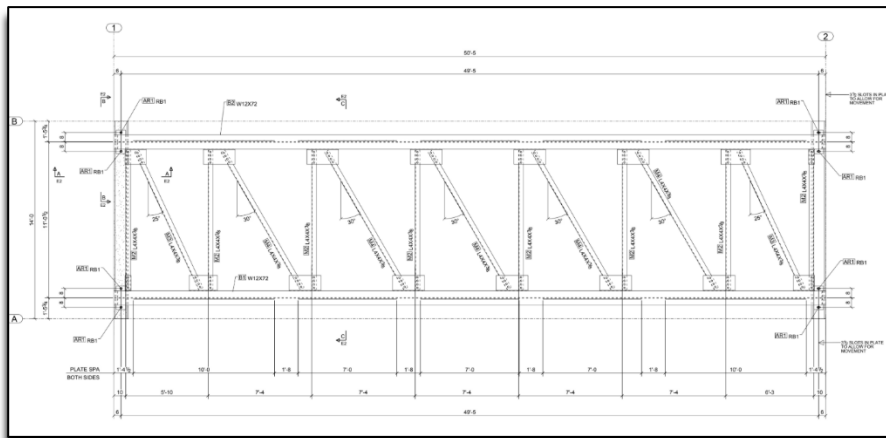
Steel framing plan provided by NFE from Utica Steel Shop drawings
